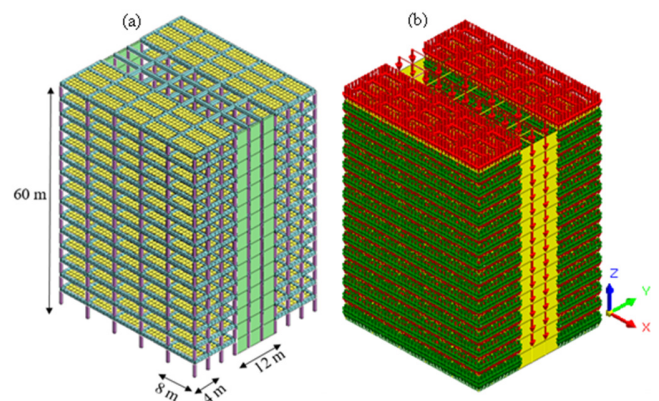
3D plan of 15-story building: (a) building dimensions, (b) dead and live loads distribution.
